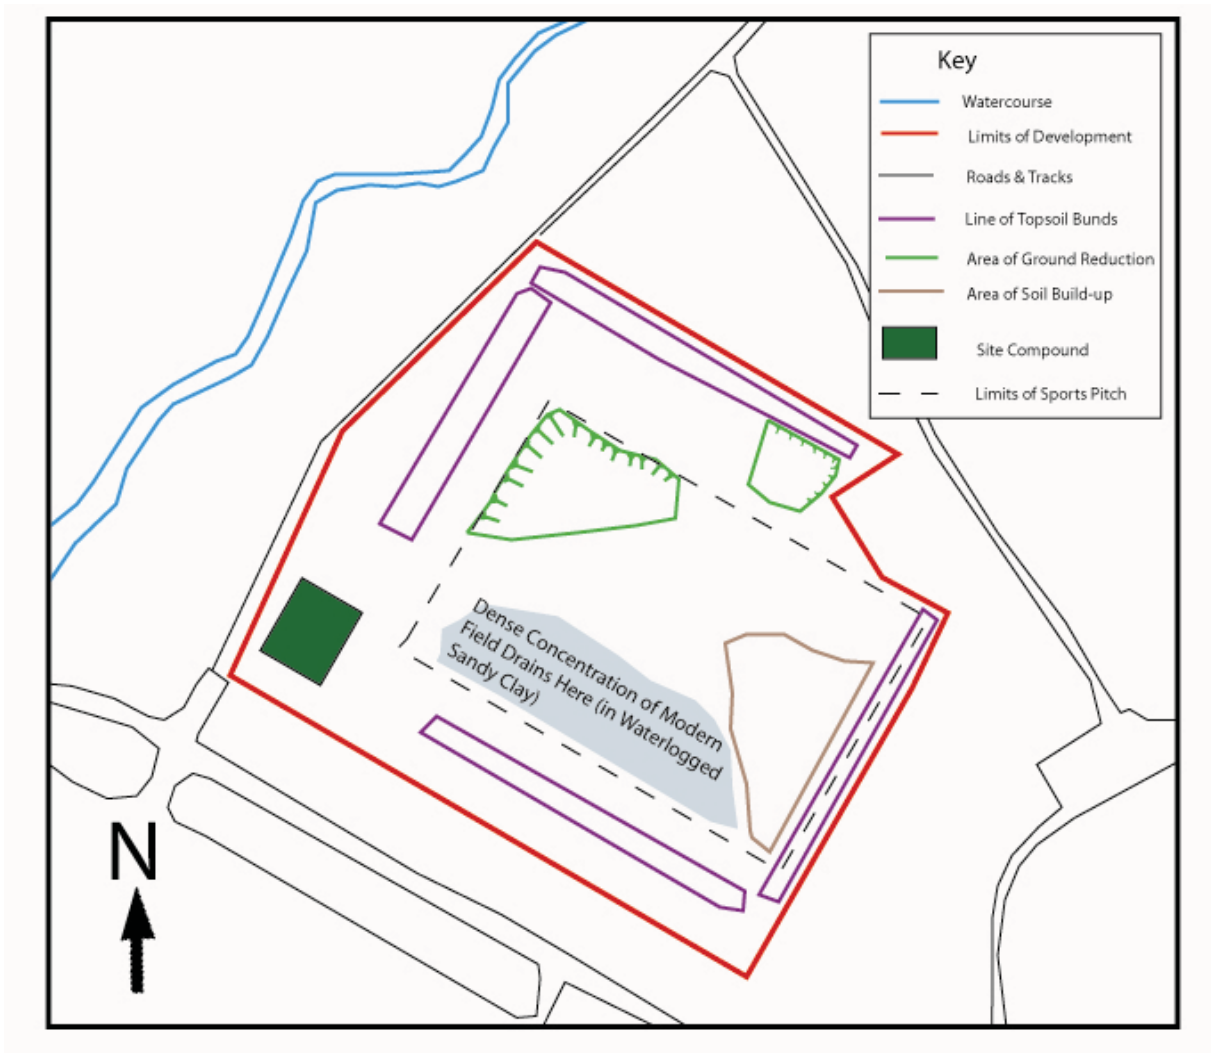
Site Plan, Showing Areas of Ground Reduction and Build-up
